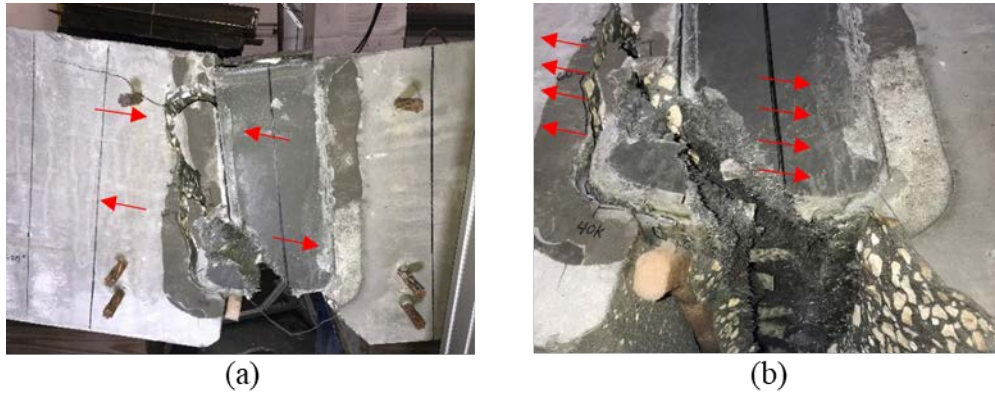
18F1-2: (a) fractured joint specimen from west side and (b) bottom view of joint failure from west side
